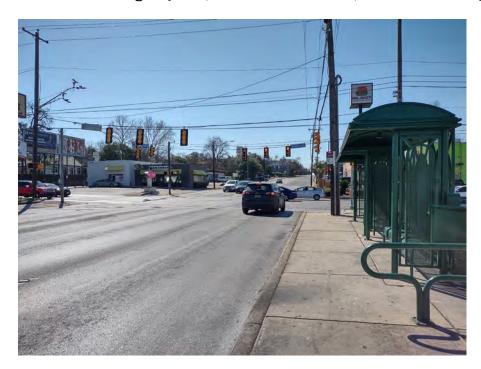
VIA Bus Station. Facing South. Located on San Pedro Avenue at intersection of San Pedro and West Hilderbrand Ave (near railway crossing on West Hilderbrand Ave).
